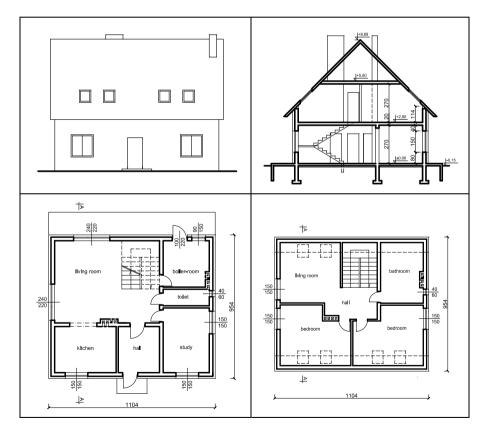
Scheme of the tested single-family house: A – front elevation; B – vertical section; C – ground floor plan; D –plan of a heated attic
